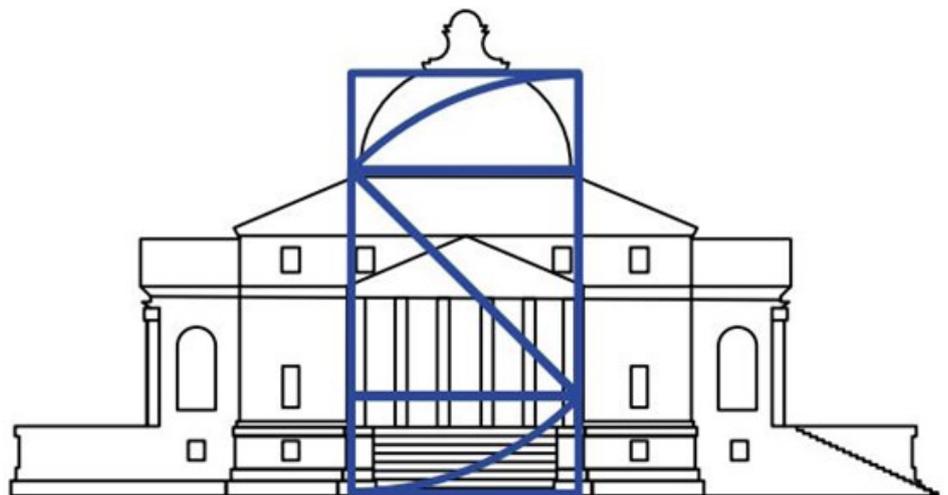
Figure E: elevation of Rotunda with root two rectangle proportioning tool: proposed proportionality analysis, from a sketch by author ("Portrait of a bridge...", 2019). It must be noted that Palladio's elevation had no lantern at the top of the dome, while Bertotti Scamozzi's drawing includes one.
